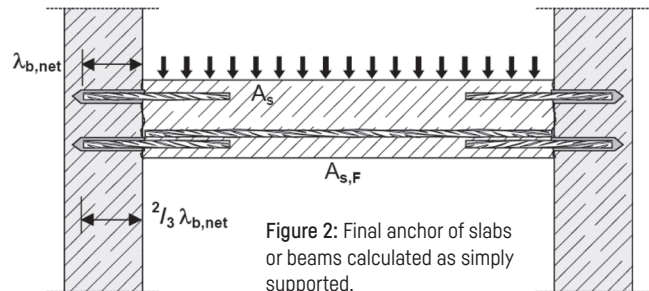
Final anchor of slabs or beams calculated as simply supported.
